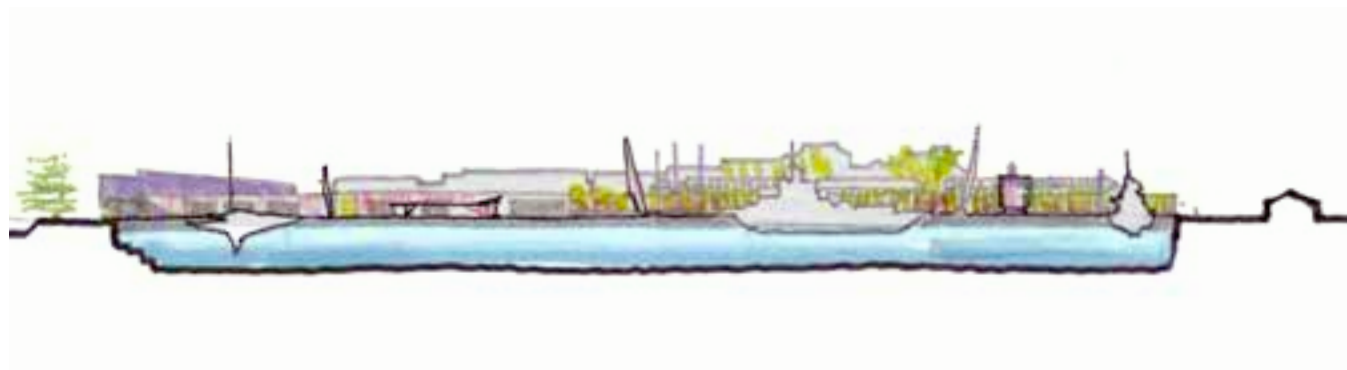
Section through active dockyard, showing main passageway in background.
